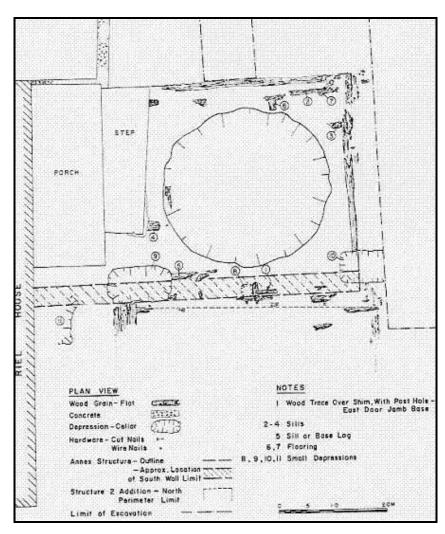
Plan view of the Louis Riel Annex excavation (Parcs/Parks Canada).
